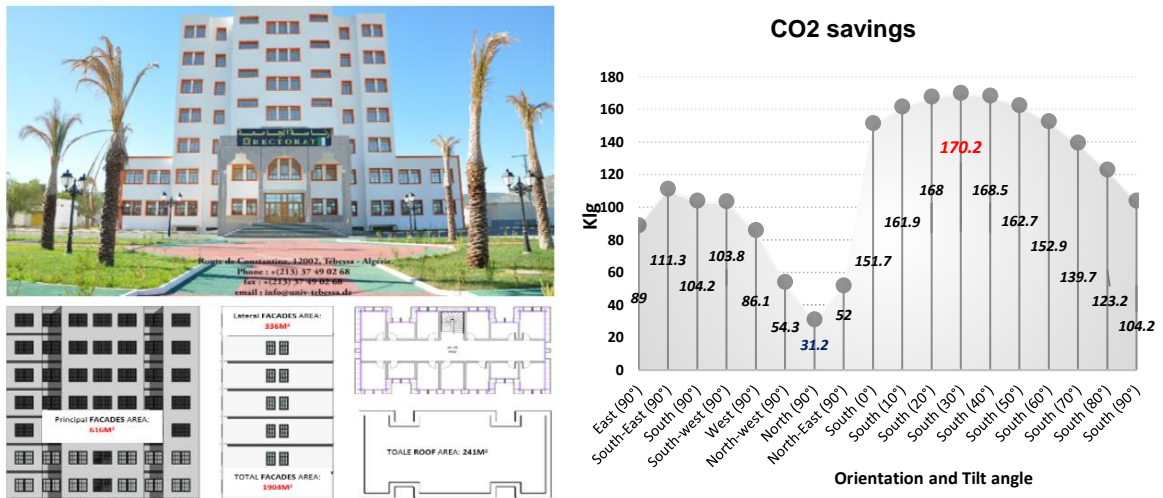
the area of potential BIPV used (Roof, opaque, windows) and CO2 savings against the orientation and tilt angle of BIPV window façade.
